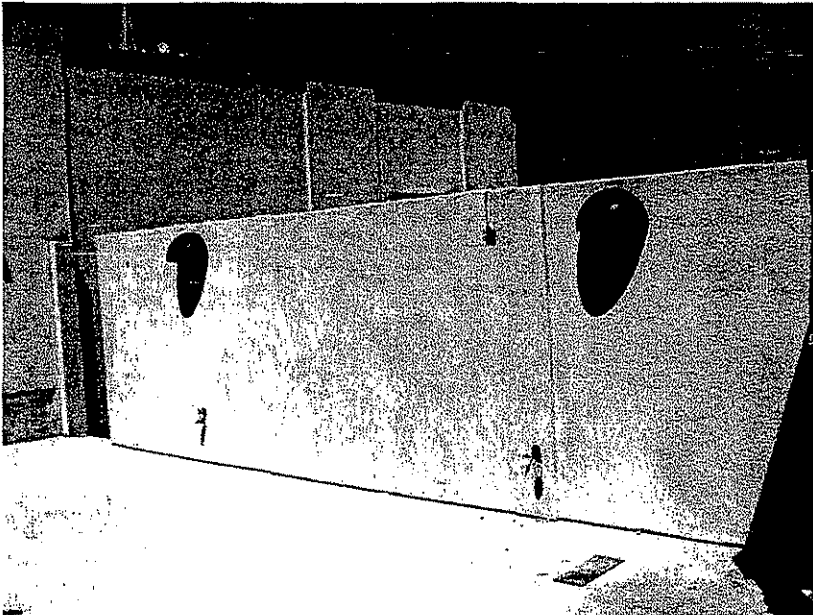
New stucco wall built at rear of new roof deck to separate deck from mechanical units on the rear section of the roof. The wall is seven feet high measured from deck level.
